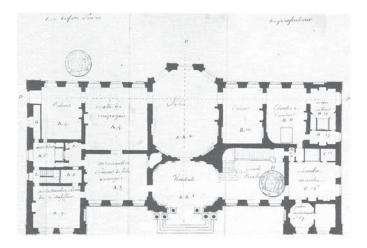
Blondel. Ideal hôtel. Main floor plan.
